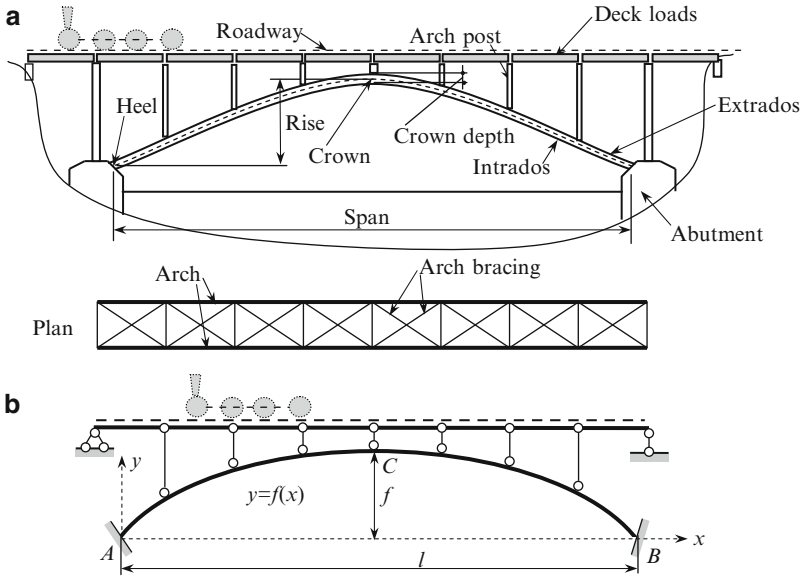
(a, b) Components of an arch bridge and design diagrams for a deck-arch bridge
